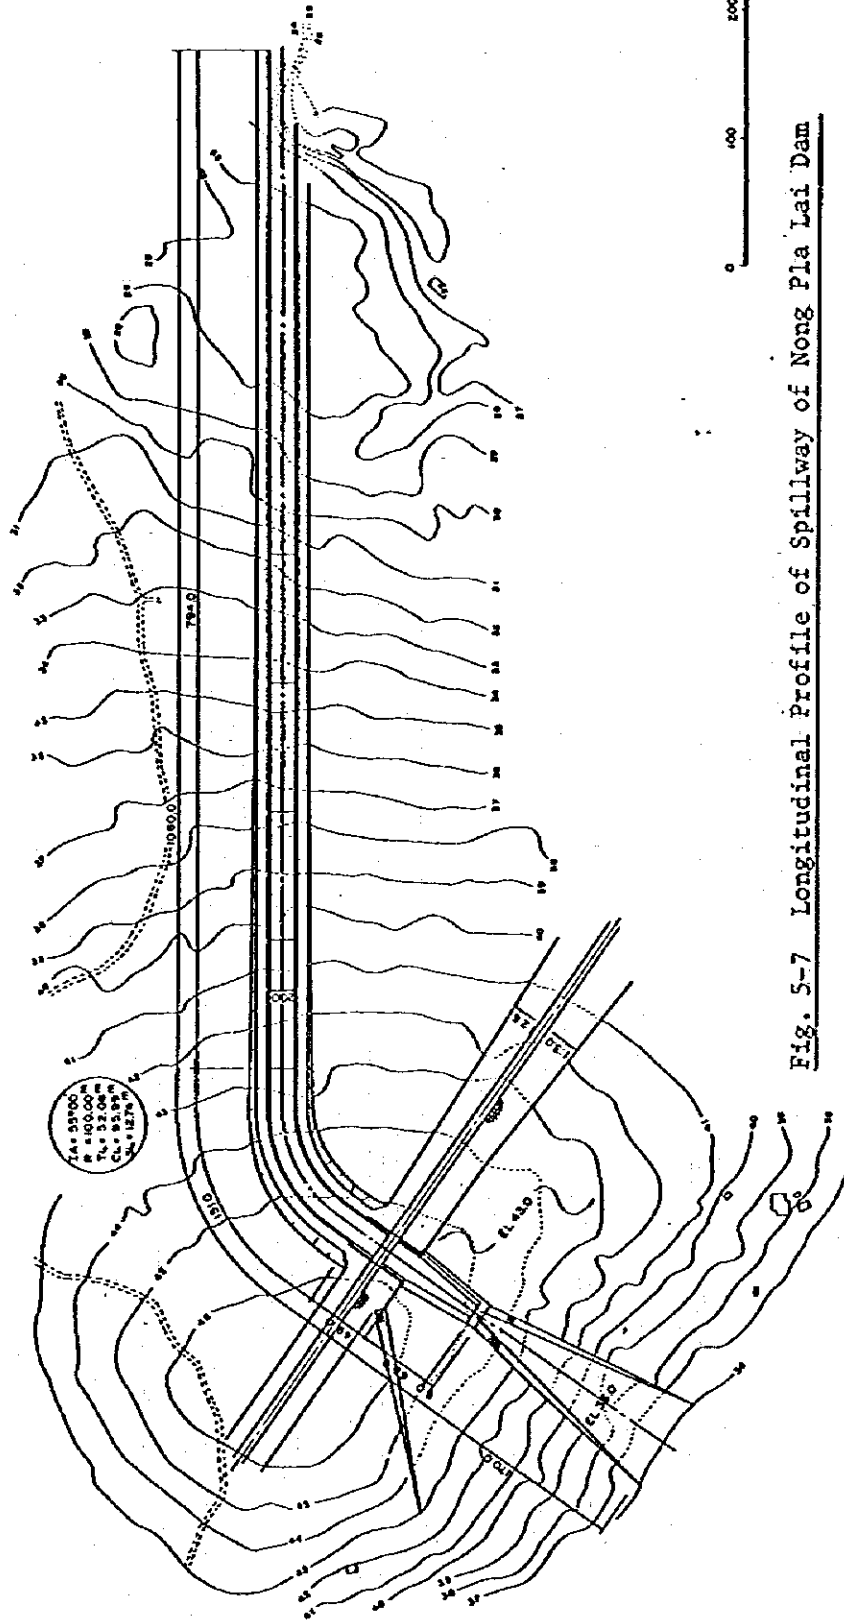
Longitudinal Profile of Spillway of Nong Pla Lai Dam
